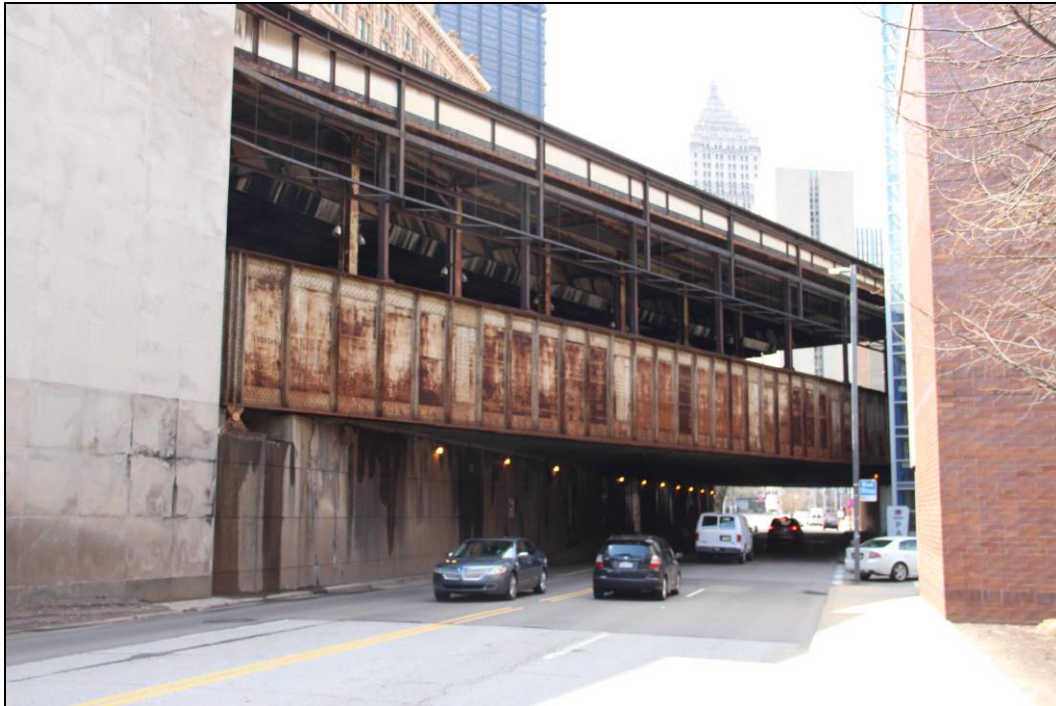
Contributing undergrade plate girder bridge at Liberty Avenue in relation to Pennsylvania Station. Section of trainshed (1953-59) built atop bridge. View from Liberty Avenue at the intersection with Twelfth Street, facing southwest.
